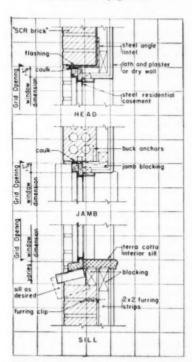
Steel residential casement window with wood surround in "SCR brick" wall. This detail is applicable to standard steel casement widths of 3' 1", 4' 51/8", and 5' 93%"
